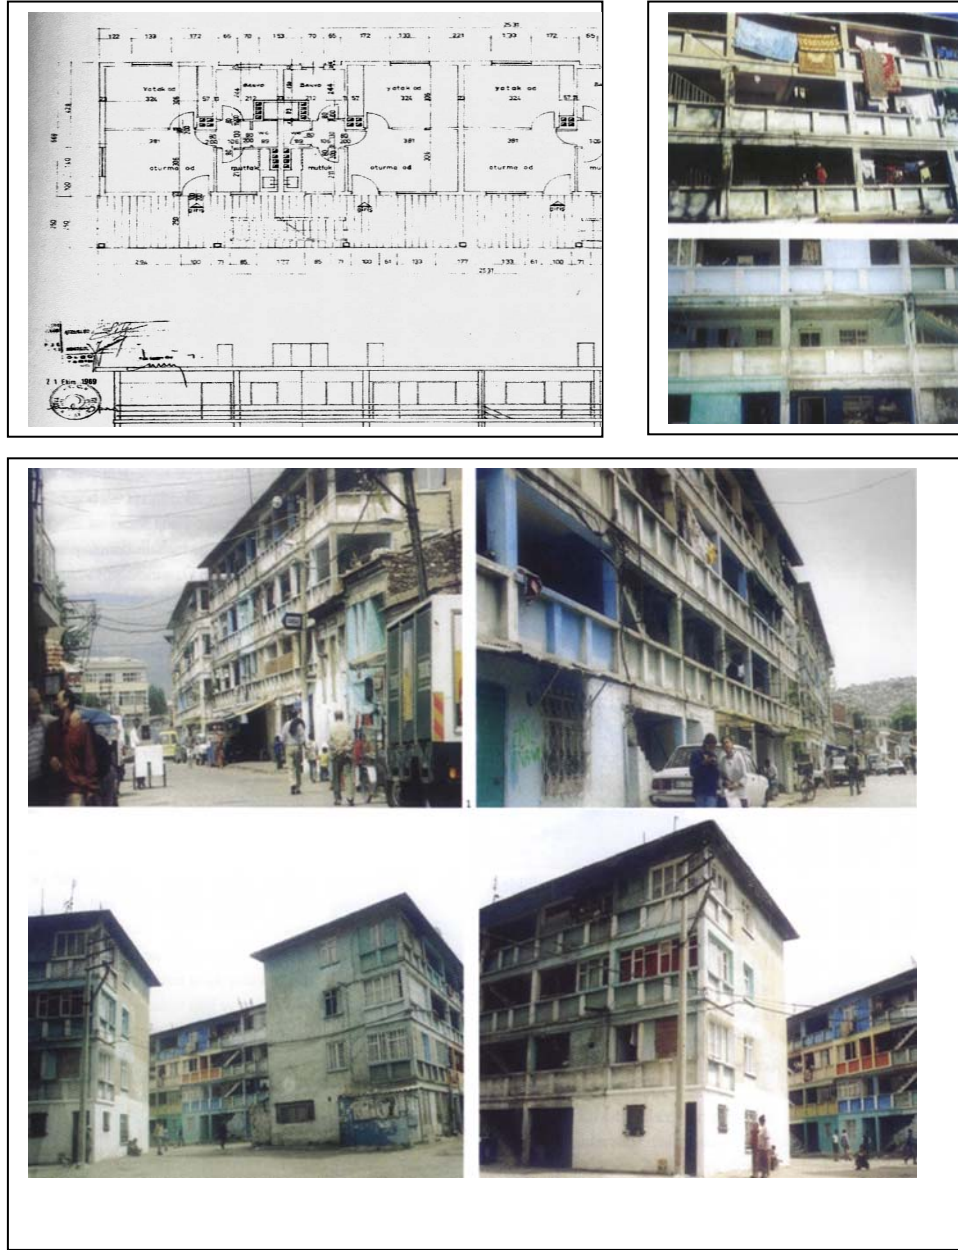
“Cumhuriyet Mahallesi” Mass Housing Project in 1964, Plan & Elevation
